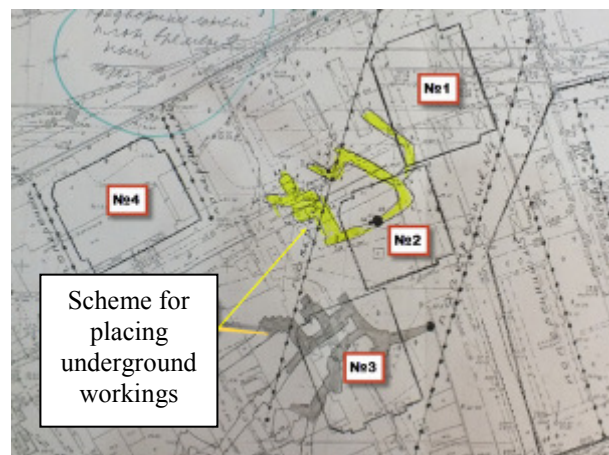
General plan of the plot with the scheme of accommodation sections of the residential complex and underground workings
